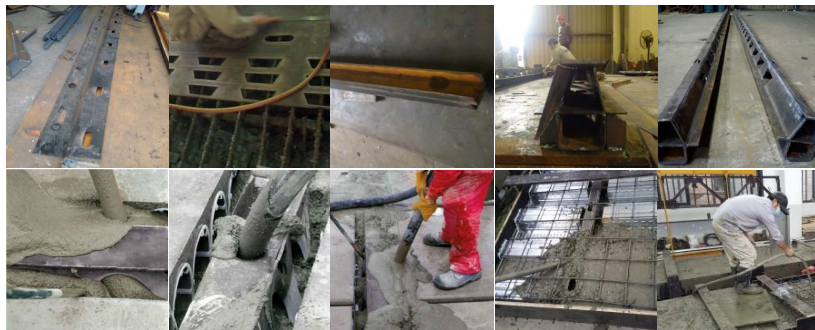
The manufacturing steel beam and cast-in-place concrete process
